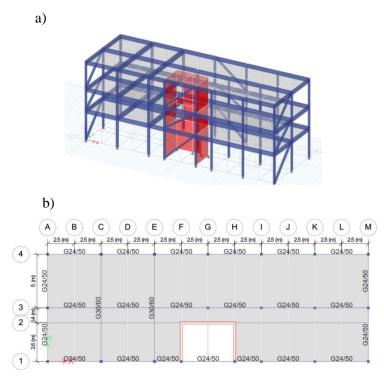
a) Numerical model; b) Ground floor plan with cross sections
